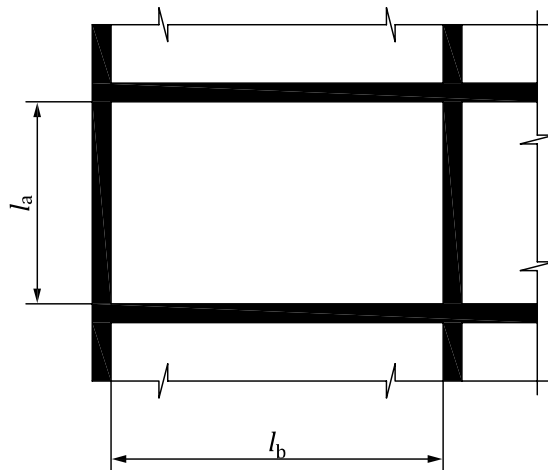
Edge panel with l_a parallel to edge, of two-way slabs supported on girders, beams or walls
